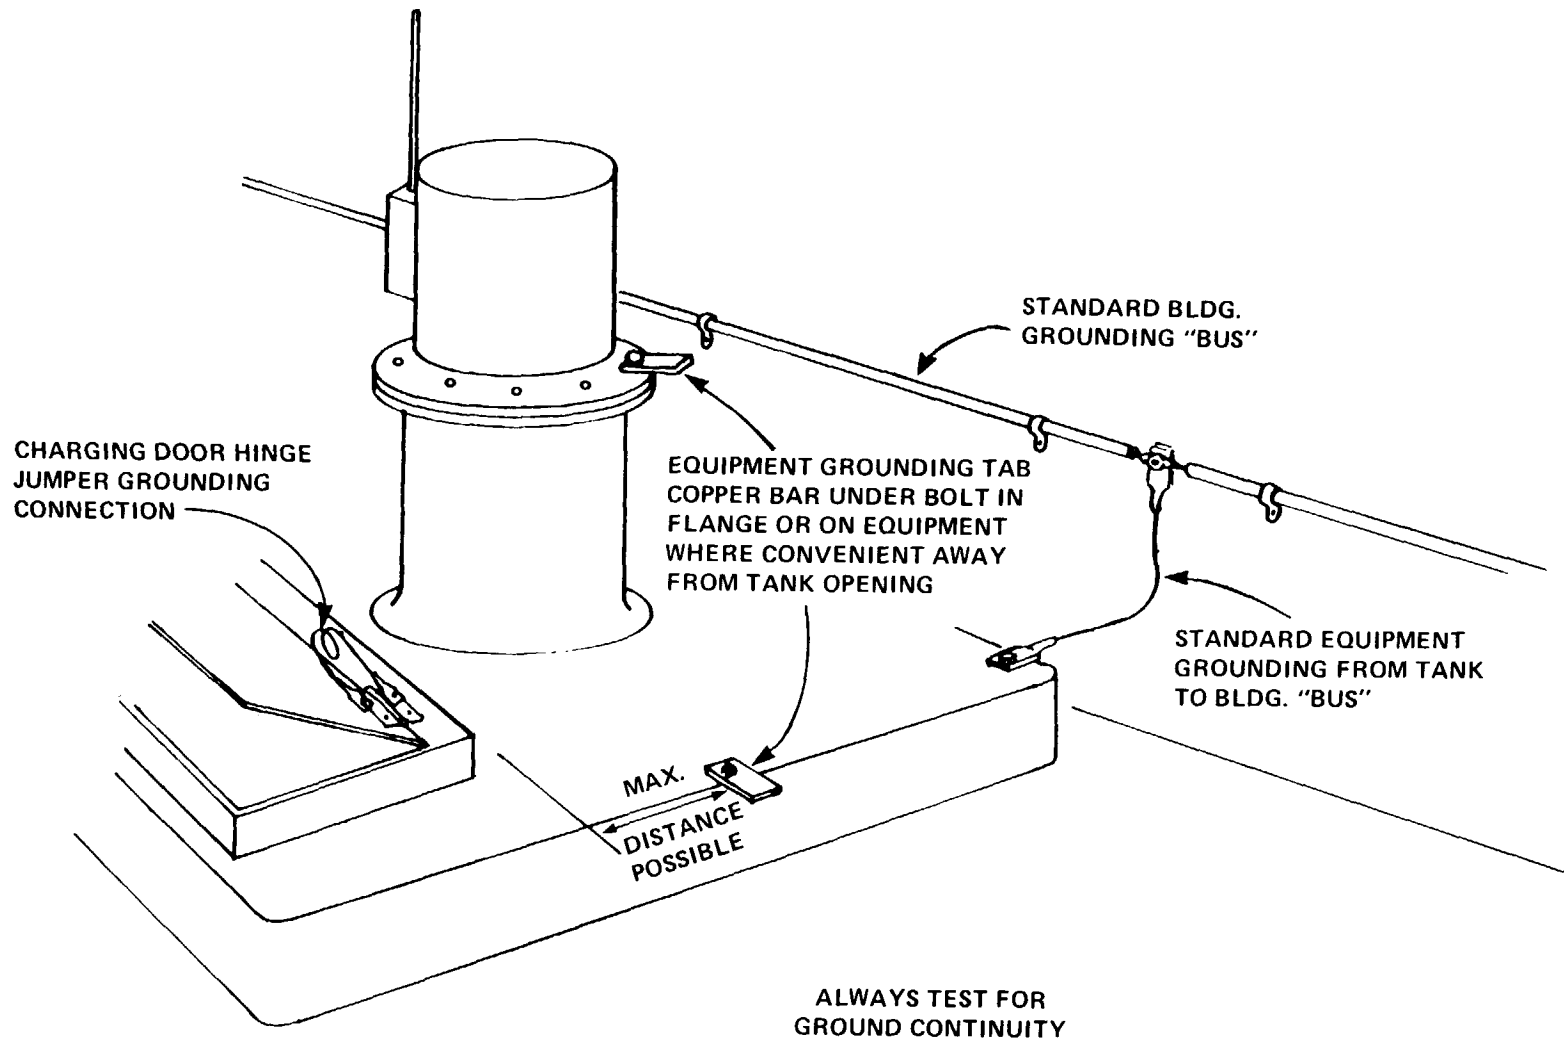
TYPICAL GROUNDING ARRANGEMENT FOR THINNING OR MIXING EQUIPMENT [32]
